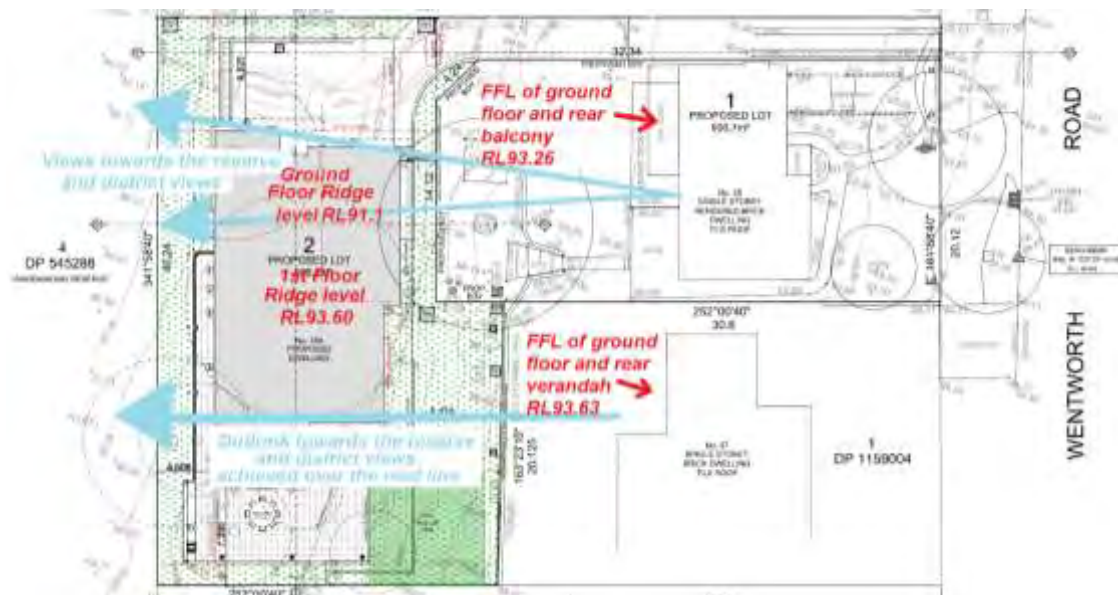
Site plan showing views and outlooks towards the reserve from Nos. 35B and 37 Wentworth Road (Source: Submitted Plans – Revision D)
